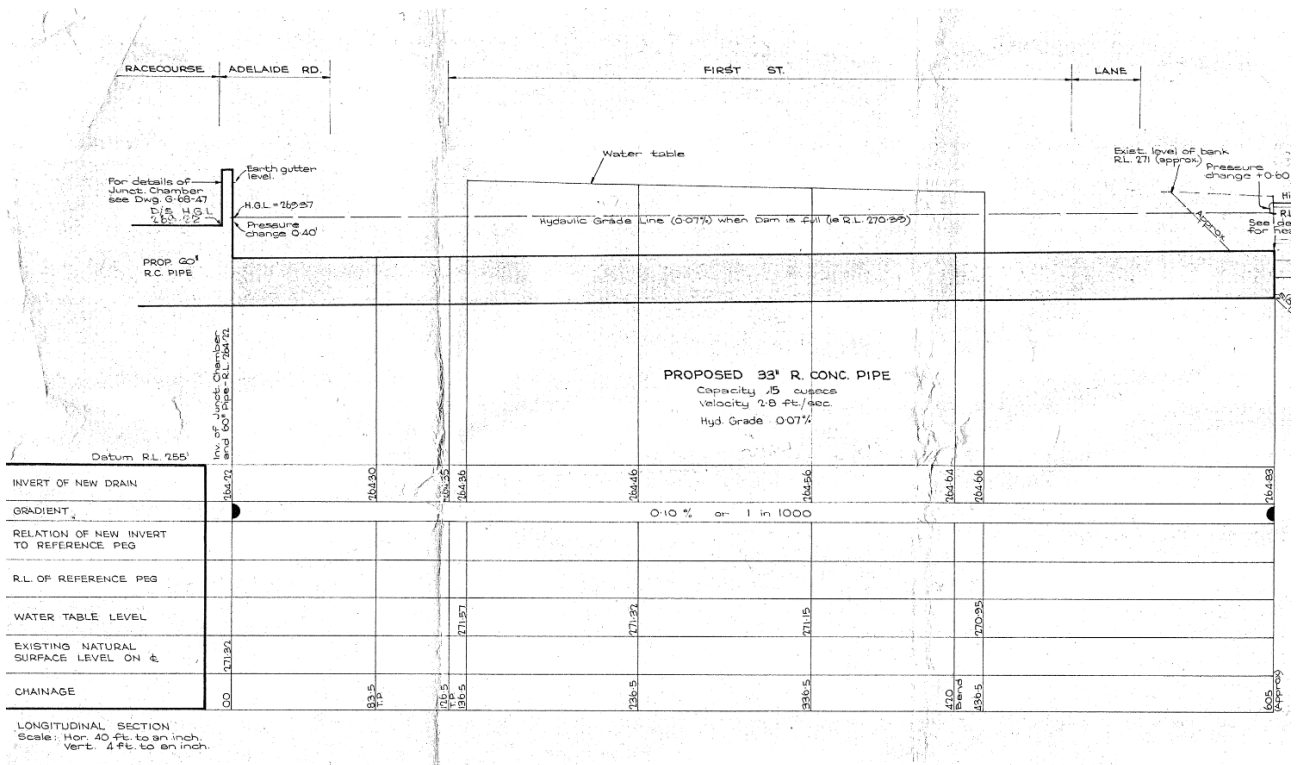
As constructed long section of existing 800mm drain, proposed to be upgraded to 1200mm.
